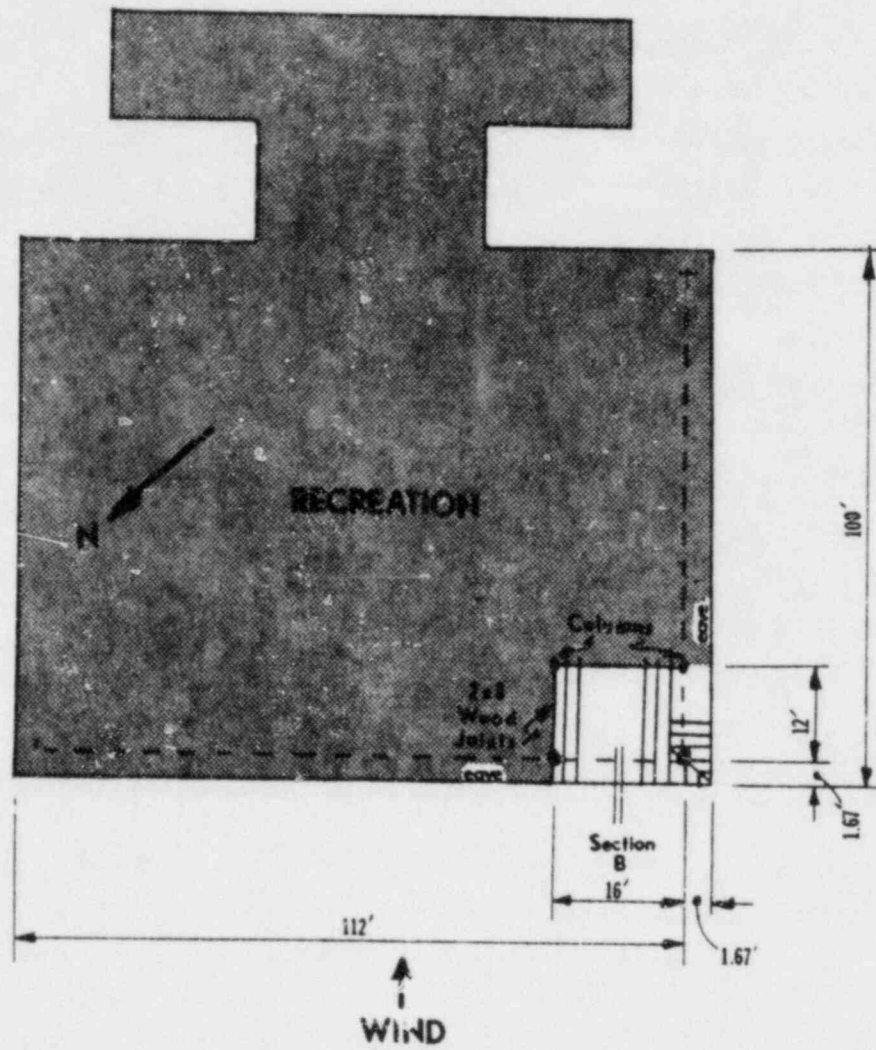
Plan view of the Recreation Building showing windward corner roof damage (unshaded portion).
